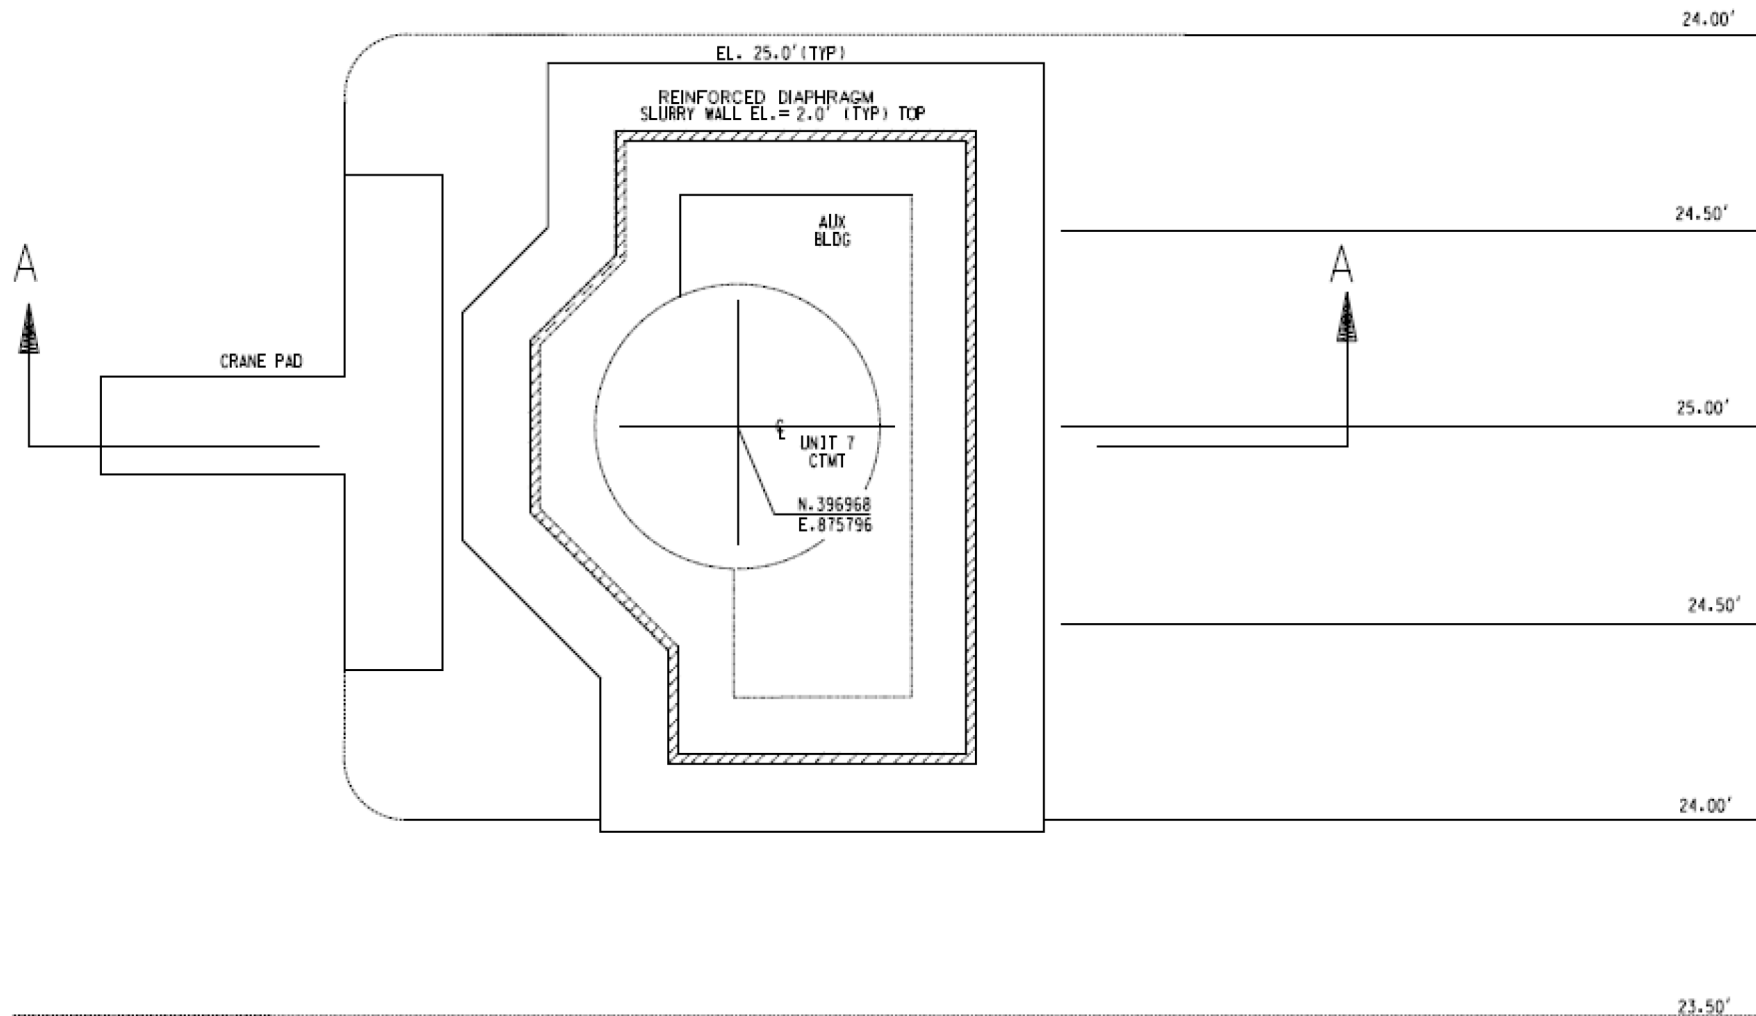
TPNP Unit 7 Excavation Limits Plan View (Reference 4)
